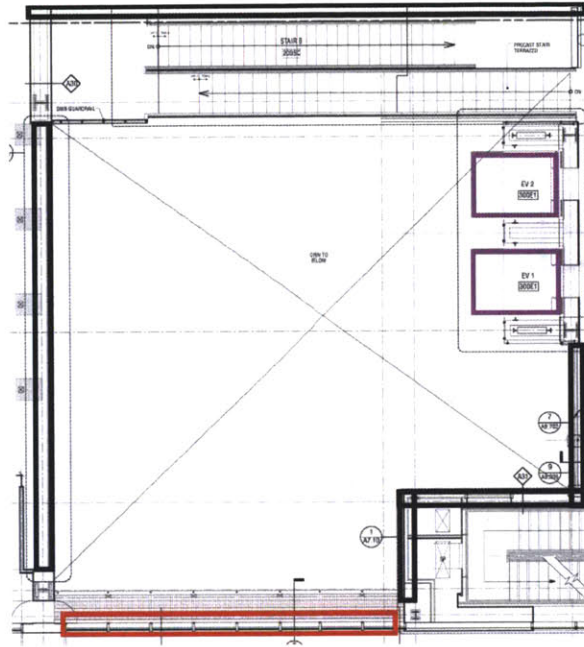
Plan view of atrium with glazed facade in red box, elevators in purple boxes, and walls in black boxes.
